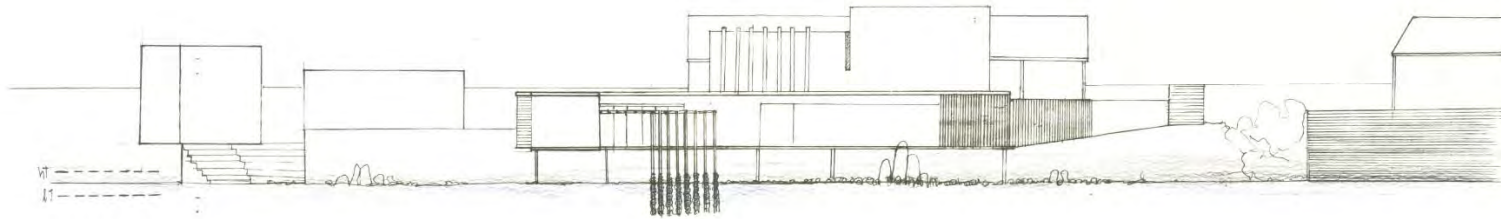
Elevation with broken planes. The language of the existing smaller factory buildings inspired the development of the restaurant. (Author, 2013)
